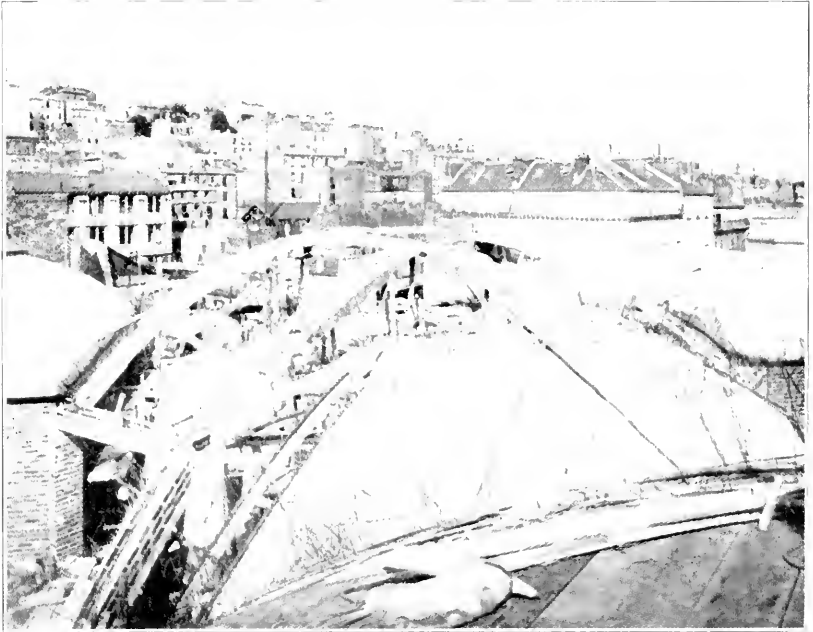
Cottançin Beam Construction in the Church of St. Jean de Montmartre.
